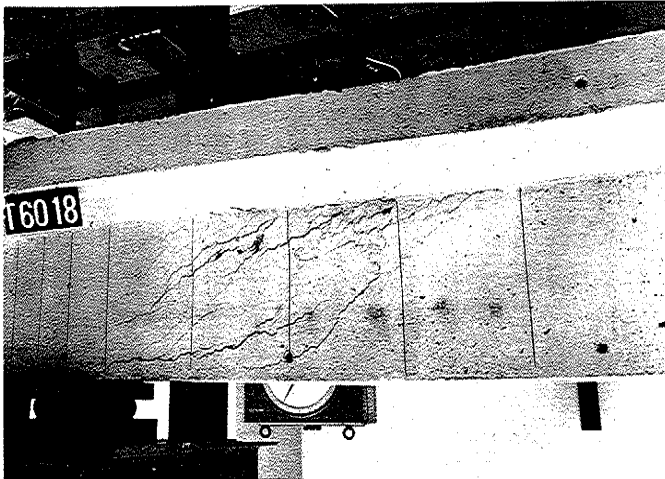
Close-up views of failures of Beam No.T6018.
